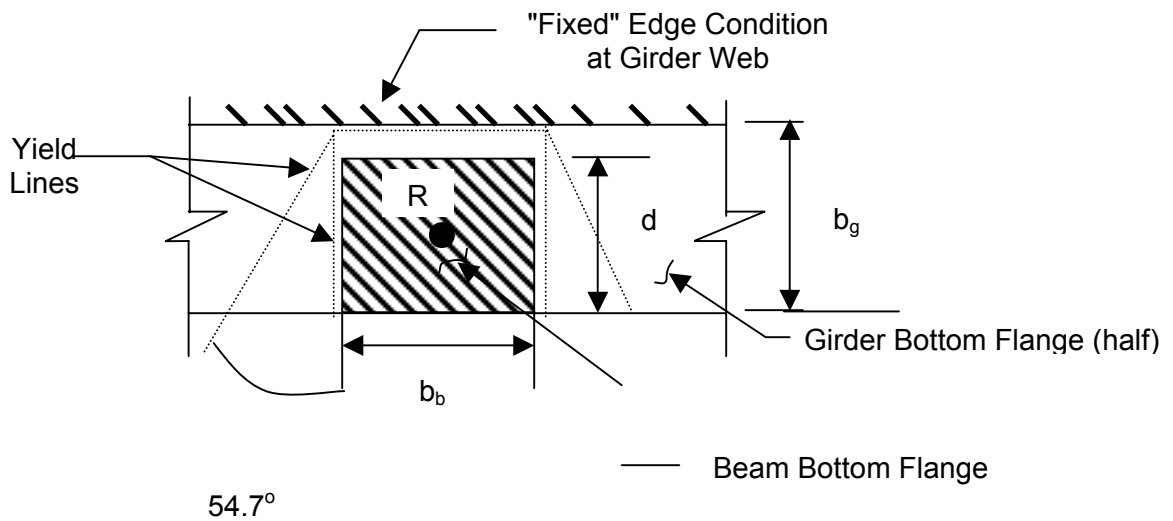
Yield Line Model of Proposed Beam-to-Girder Connection
